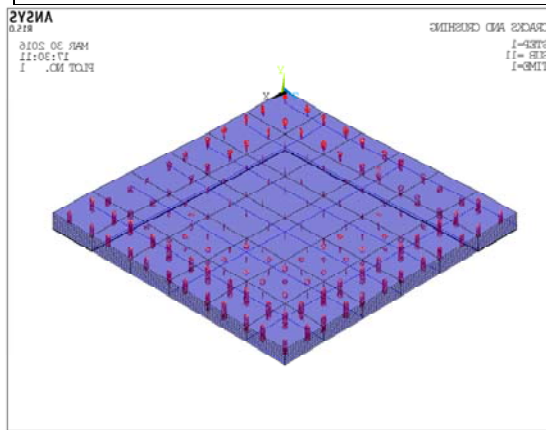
Pattern of 1st crack in slab FS3
